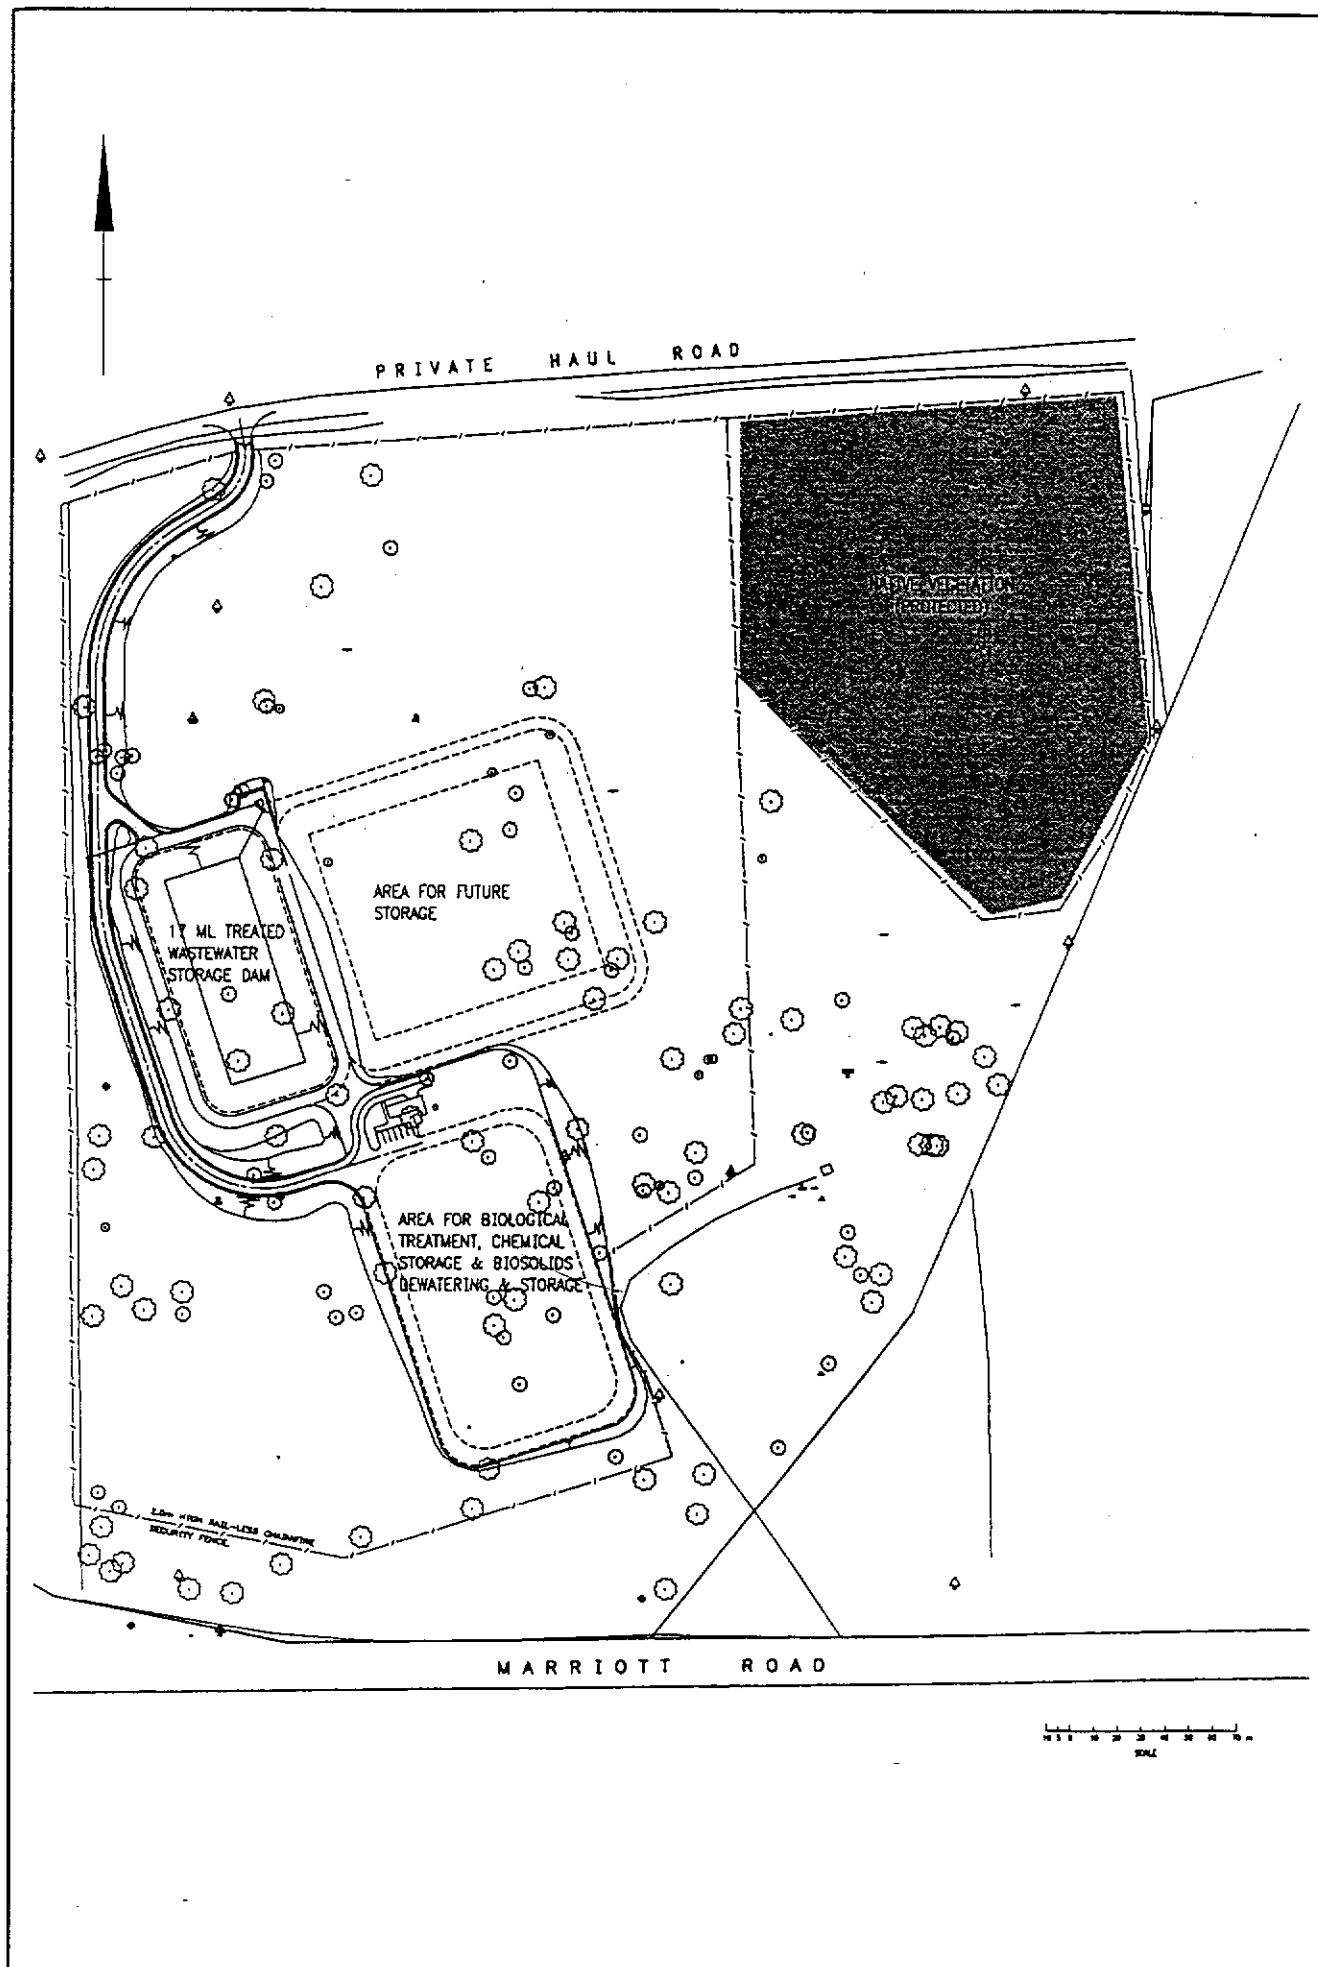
Plant layout showing vegetation on proposed Kemerton WWTP site.
